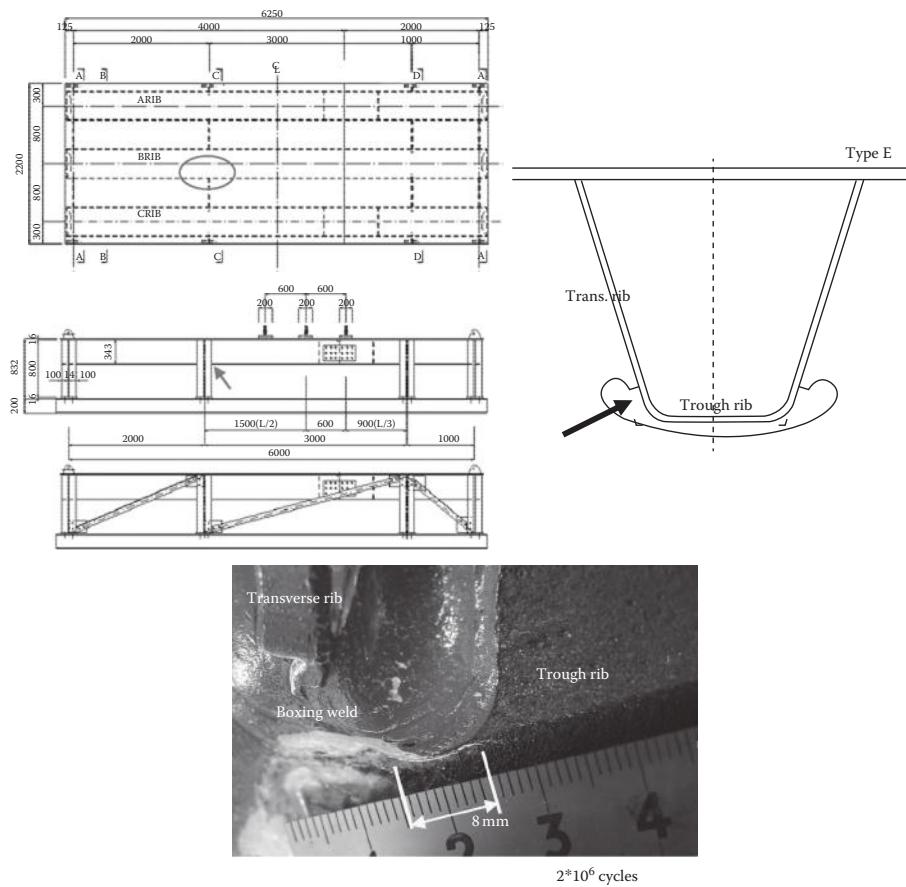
Fatigue crack in the type E connection.
